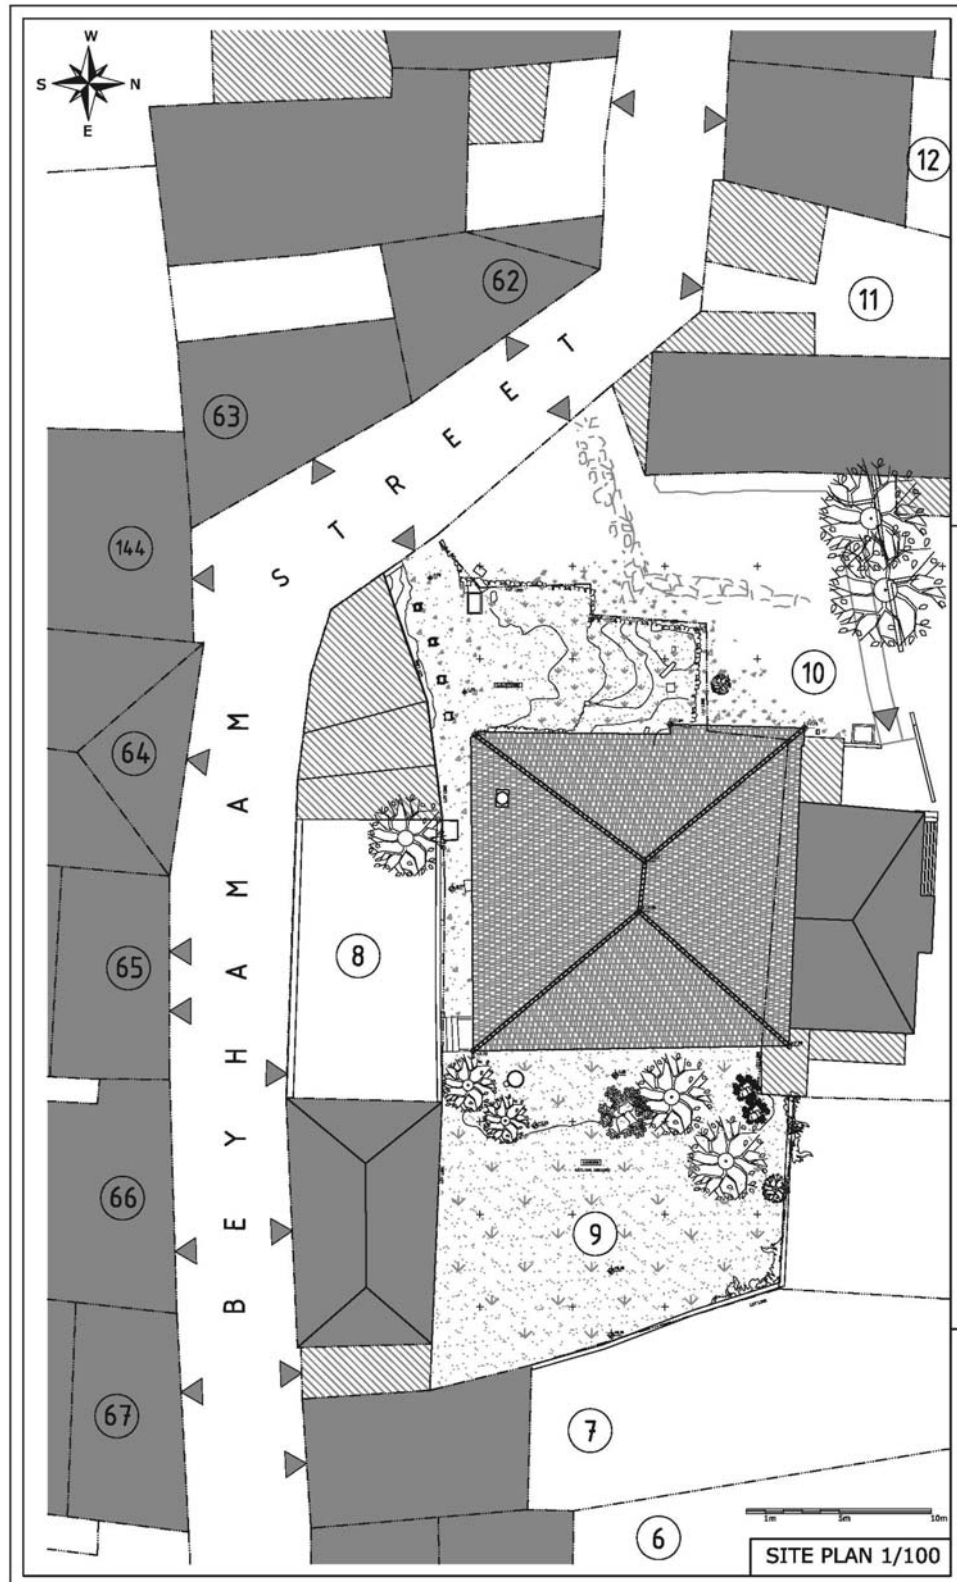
Site Plan: 1/200 (presented in 1/100 at Jury)
